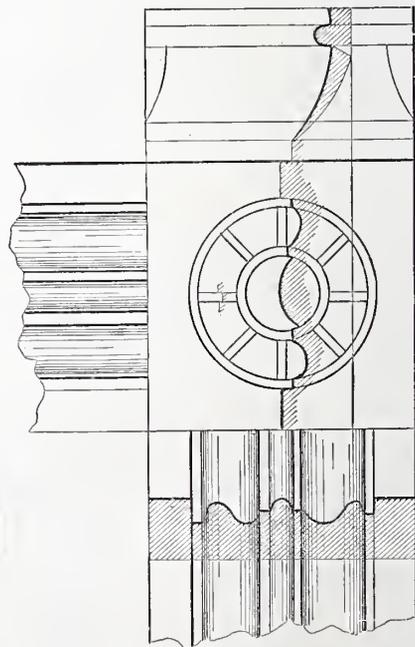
Upper Part of Architrave, First Story.—Scale, 3 Inches to the Foot.
